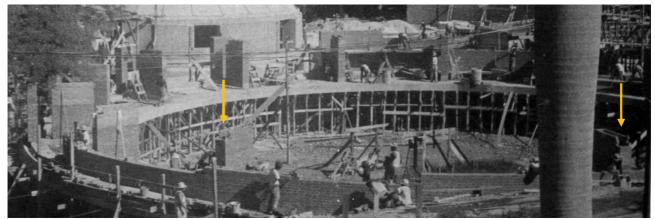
Picture from the construction site showing the empty brick formworks at the top of the pillars on the mezzanine level (ISA archive).
